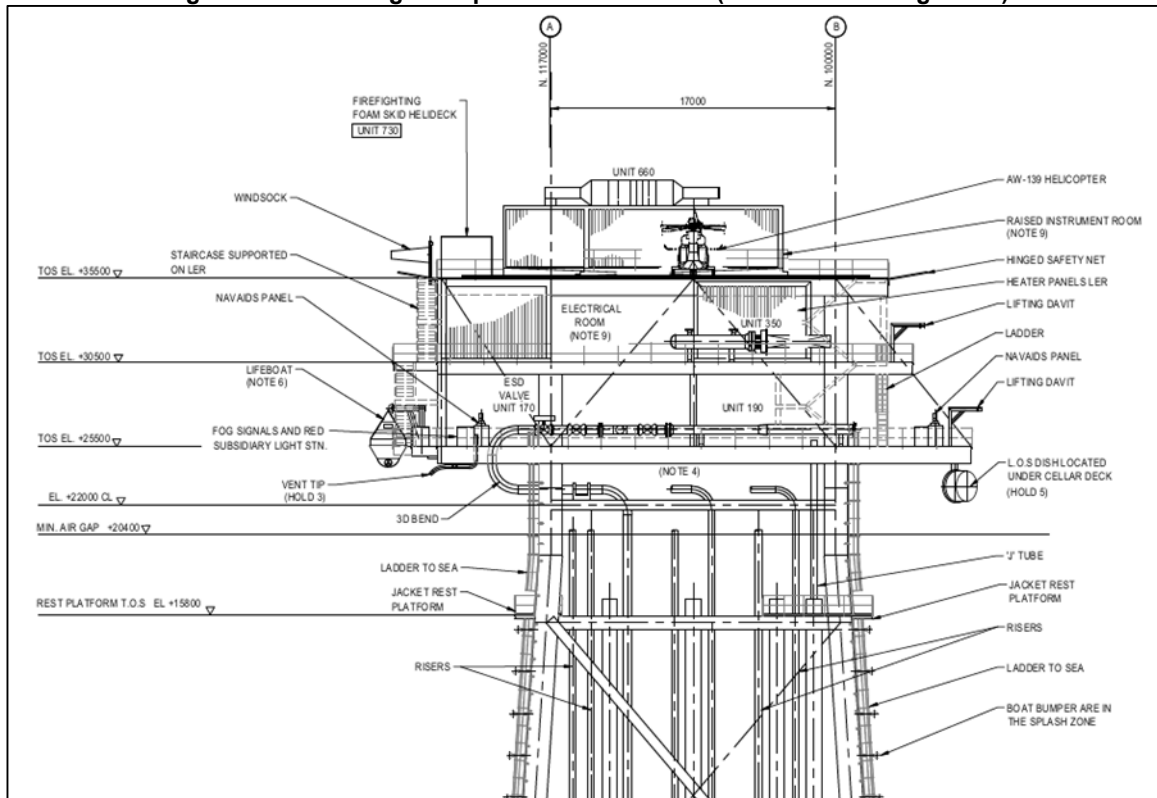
New Douglas Topside on New Jacket (Elevation Looking East)
